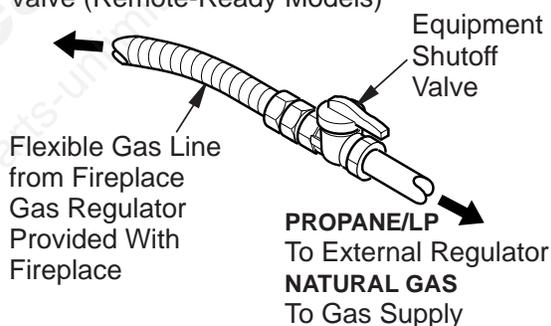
Attaching Flexible Gas Line to Equipment Shutoff Valve
